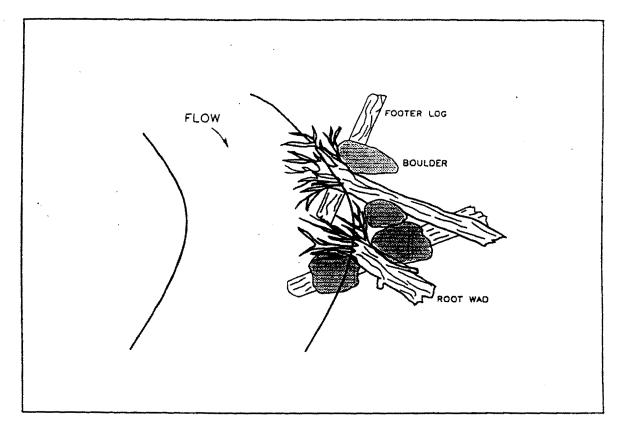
Plan view of native material revetment (Rosgen, 1993)
